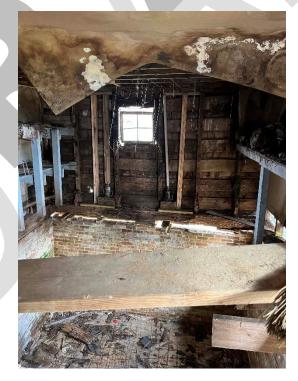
Interior view of the Barn, southernmost room of the first floor in Volume A above the brick root cellar, camera facing east (November 17,
